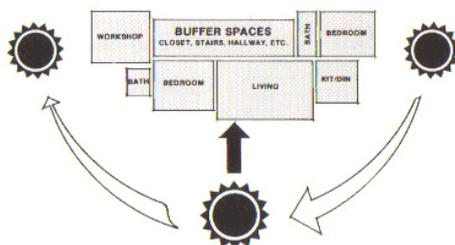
Interior space should be arranged so that rooms with high heating and lighting requirements are arrayed along the south wall.
